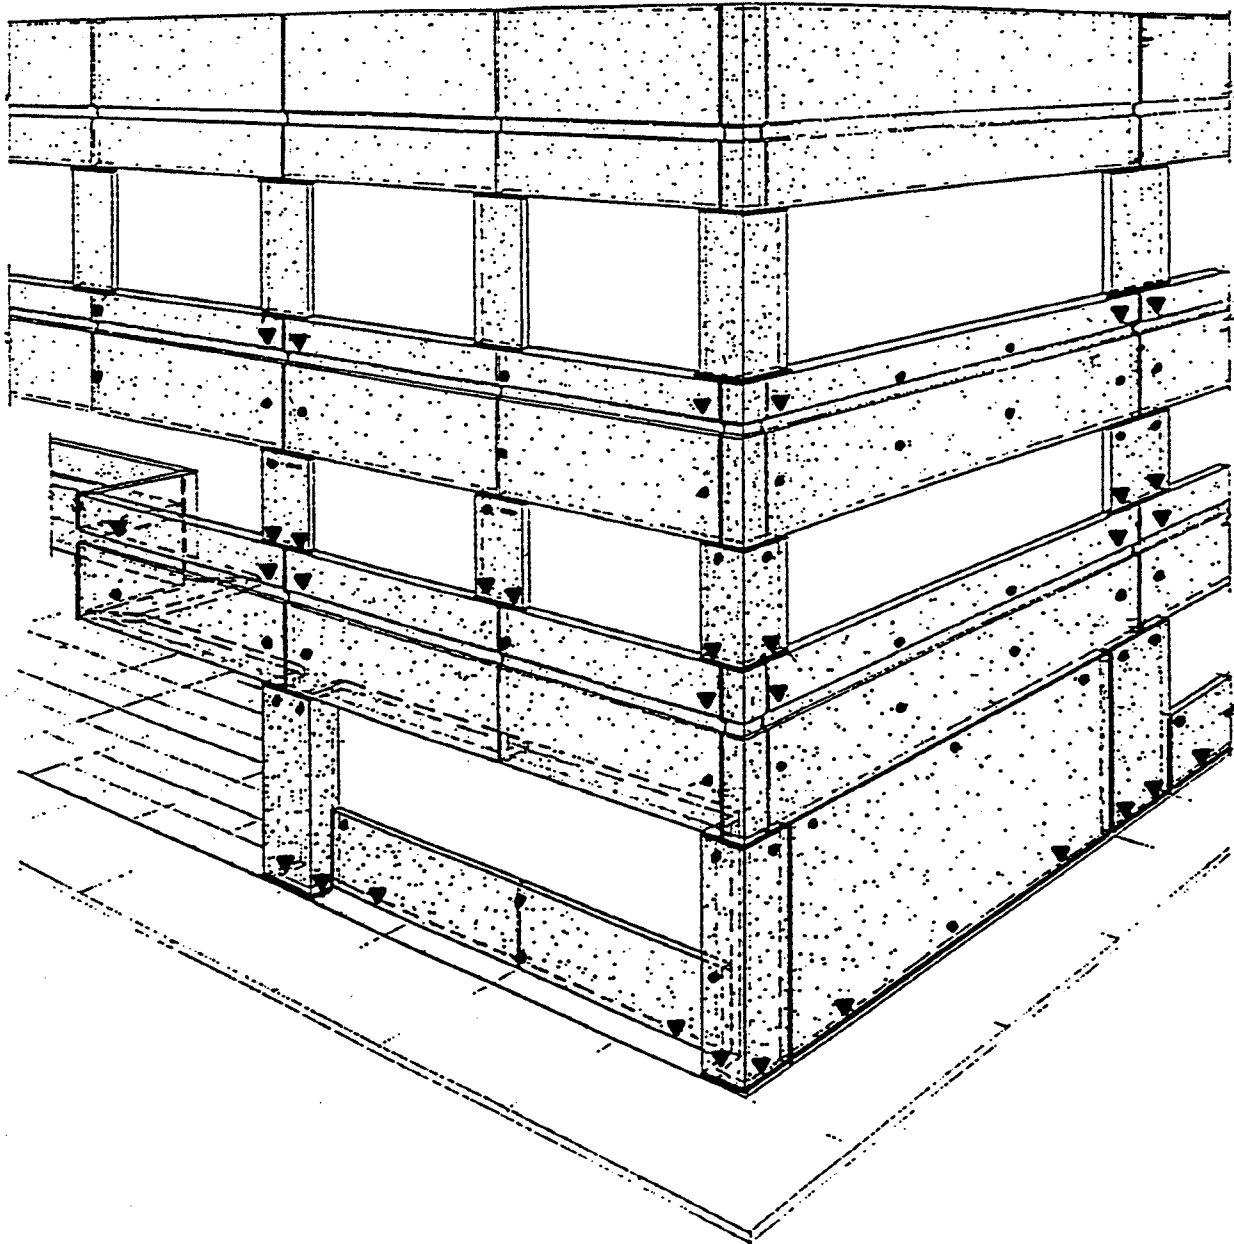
Typical architectural precast concrete panel building facade with real joints and panel connection locations shown (after Hegle [1989]).
